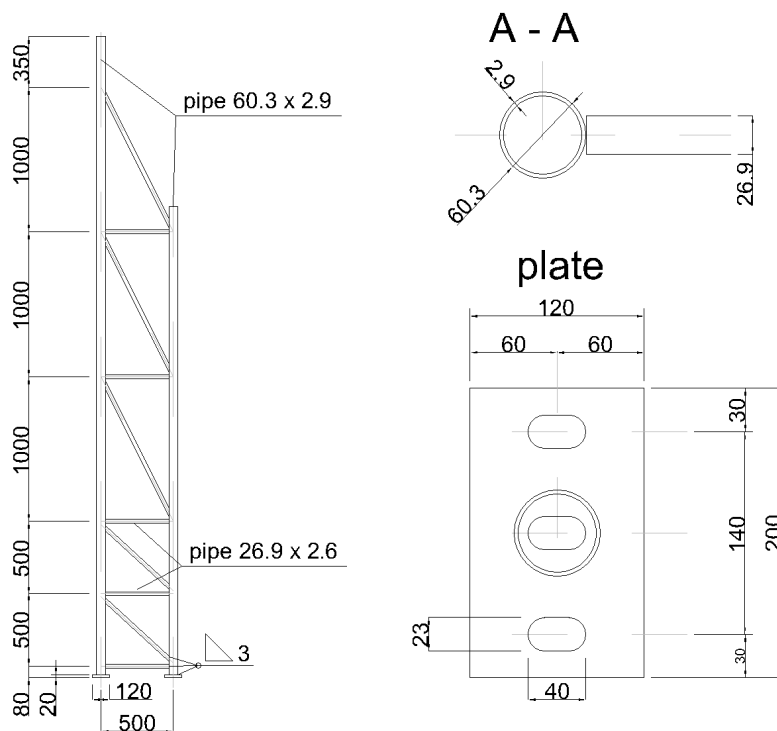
Drawings of the truss, all dimensions in mm. Left: truss. Right: Up: Section cut A - A. Down: Supporting plate.
